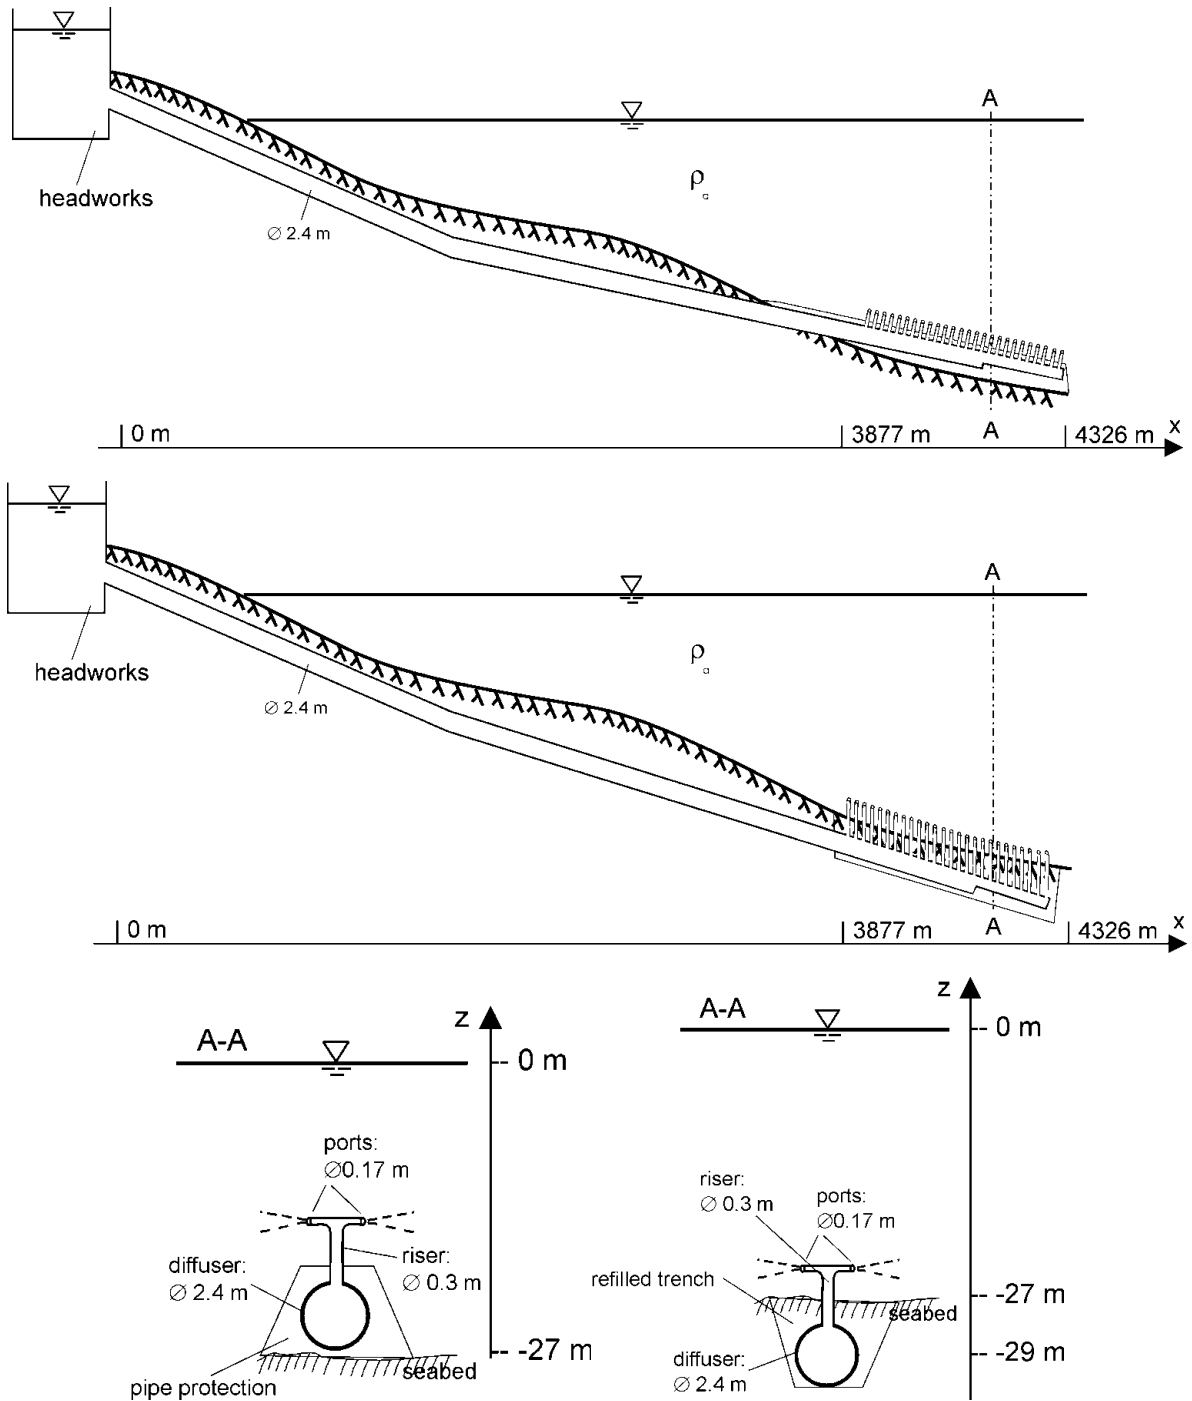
Side view and cross section of two design alternatives for the Ipanema outfall. *Left*: covered diffuser pipe and short risers, *right*: diffuser pipe laid in a refilled trench and short risers
